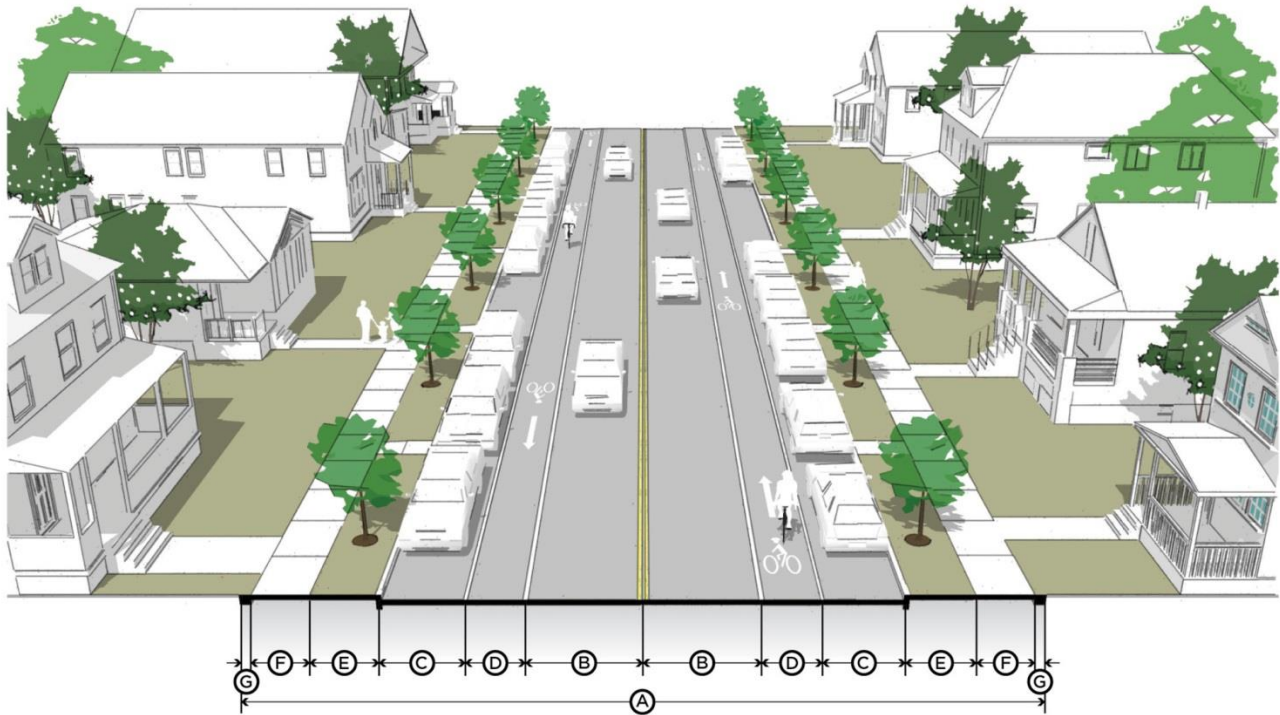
MINOR STREET: NEIGHBORHOOD TWO-LANE LOCAL STREET
